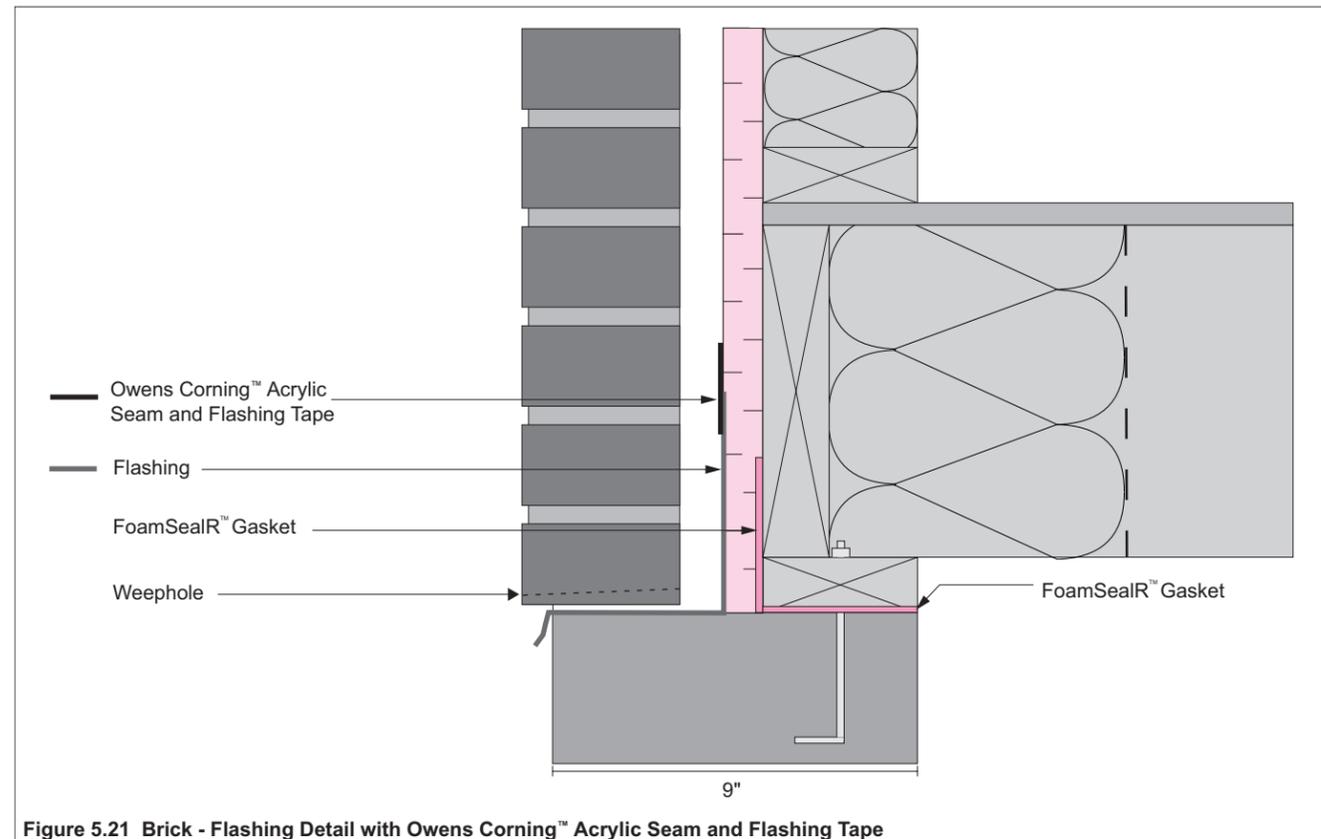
Brick - Flashing Detail with Owens Corning™ Acrylic Seam and Flashing Tape
